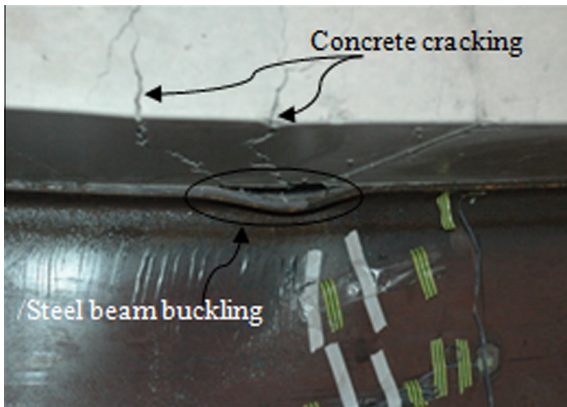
Concrete cracking and steel beam buckling.
